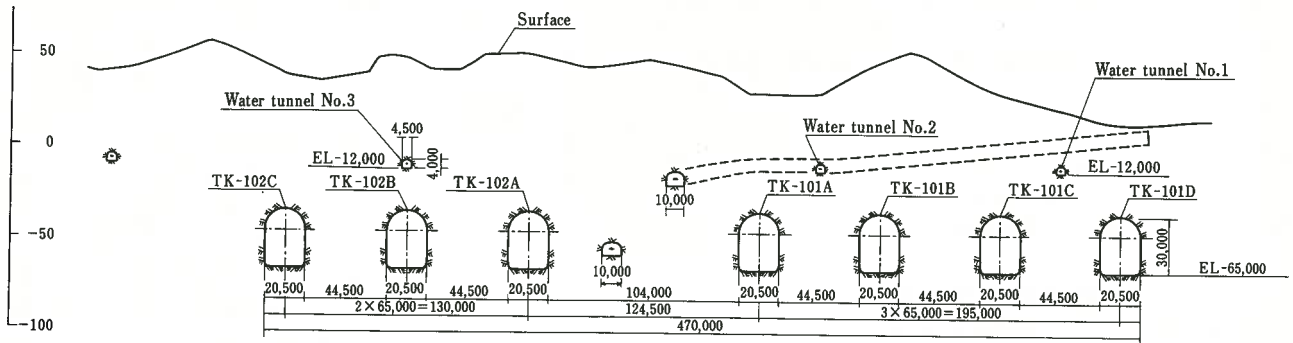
A section of Kikuma underground oil storage caverns (Takeda, 1989)
